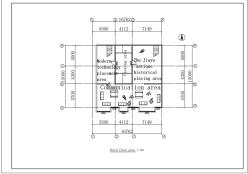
Blue Dangerous Building Renovation and First, Second, Third Floor Plan
